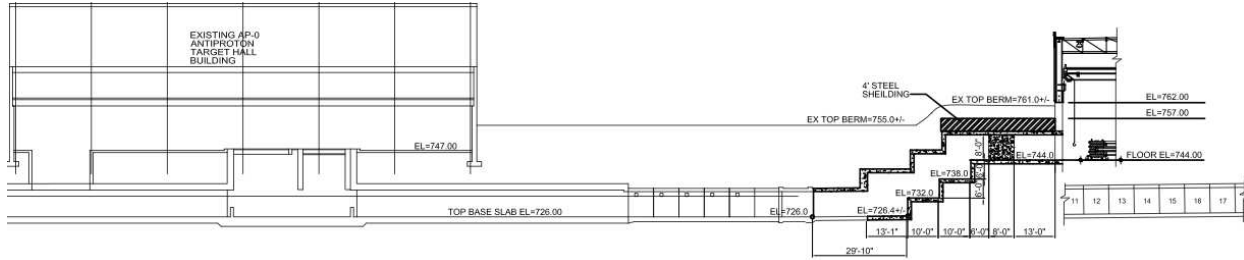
Elevation view showing the tunnel profile as it bring beam out of the AP1 tunnel and into the high-bay area of the building.
